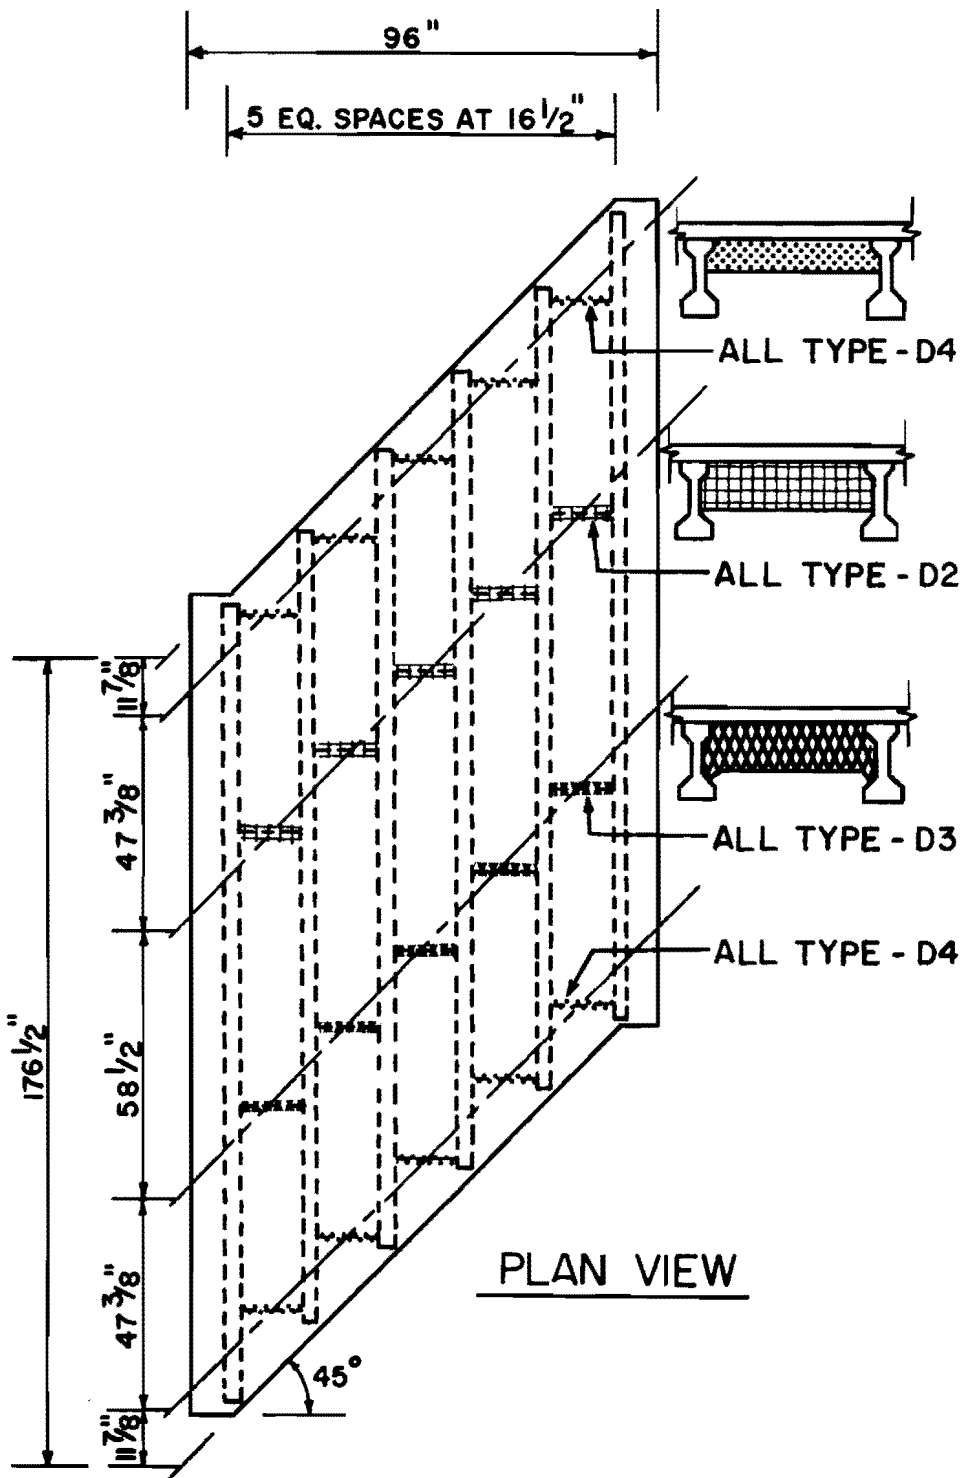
Bridge 2, general plan, diaphragm types and locations.
